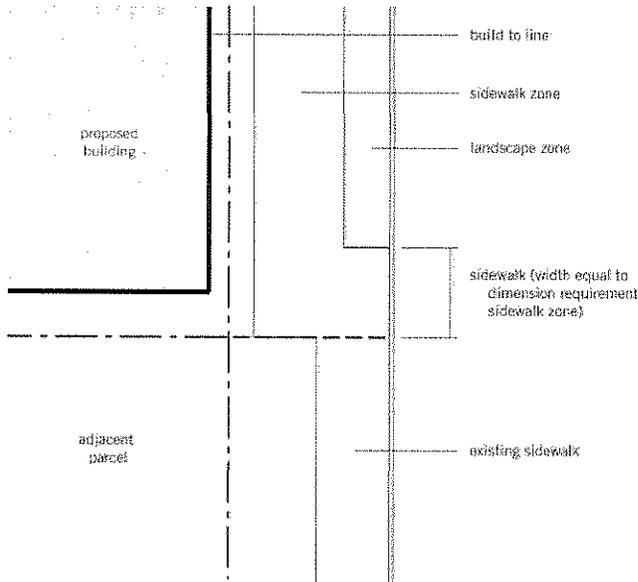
District Framework Plan - Glazing, Fig 2.8 - Sidewalk Alignment
